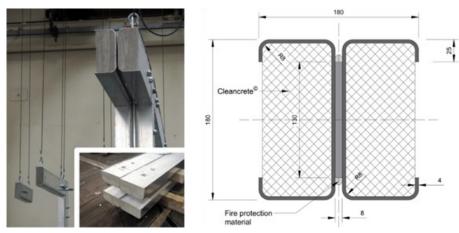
MORE DETAIL ON THE STAHLKAMMER SYSTEM: HYBRID SYSTEM OF CONCRETE AND CLEANCRETE® WHICH ALLOWS BOTH FOR DESIGN FOR DISASSEMBLY AFTER THE LIFE OF THE BUILDING AND PROVIDES THE REQUIRED FIRE-RESISTANCE.
